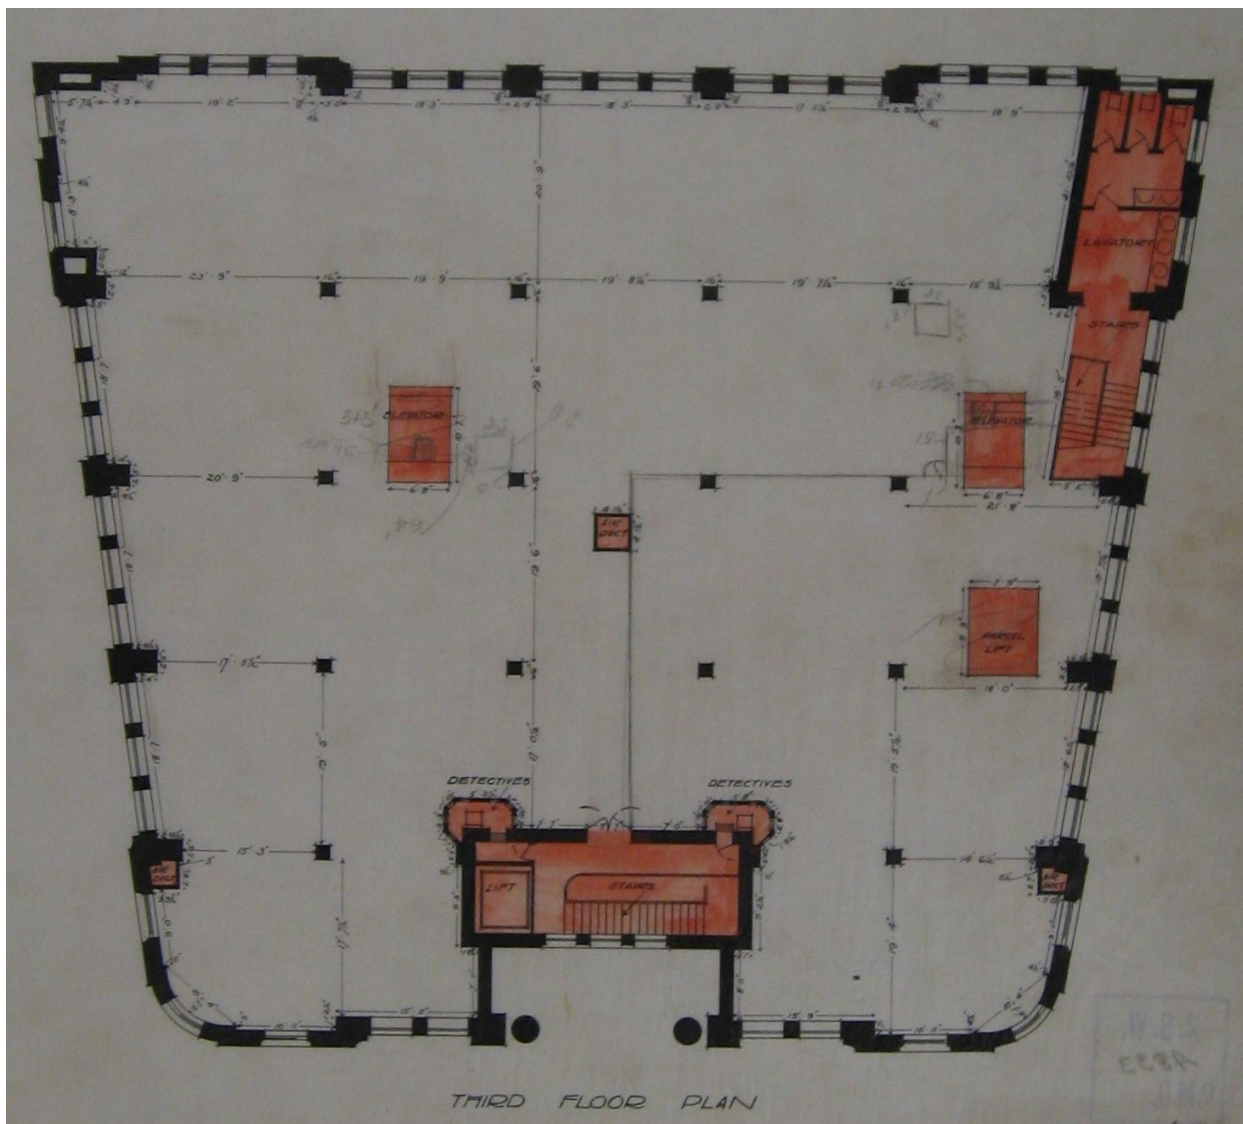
Mail Sorting Office Central Railway Station Sydney, third floor plan, 1914. Signed by George J Oakeshott (works Director).
